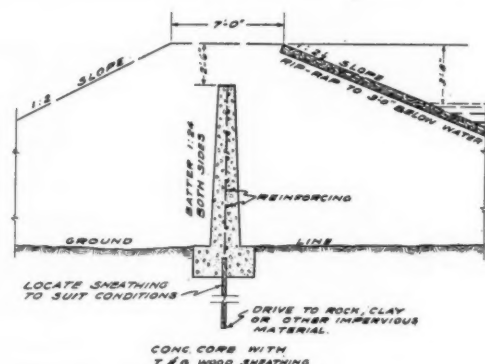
Section of dam with concrete core wall and t & g sheathing
